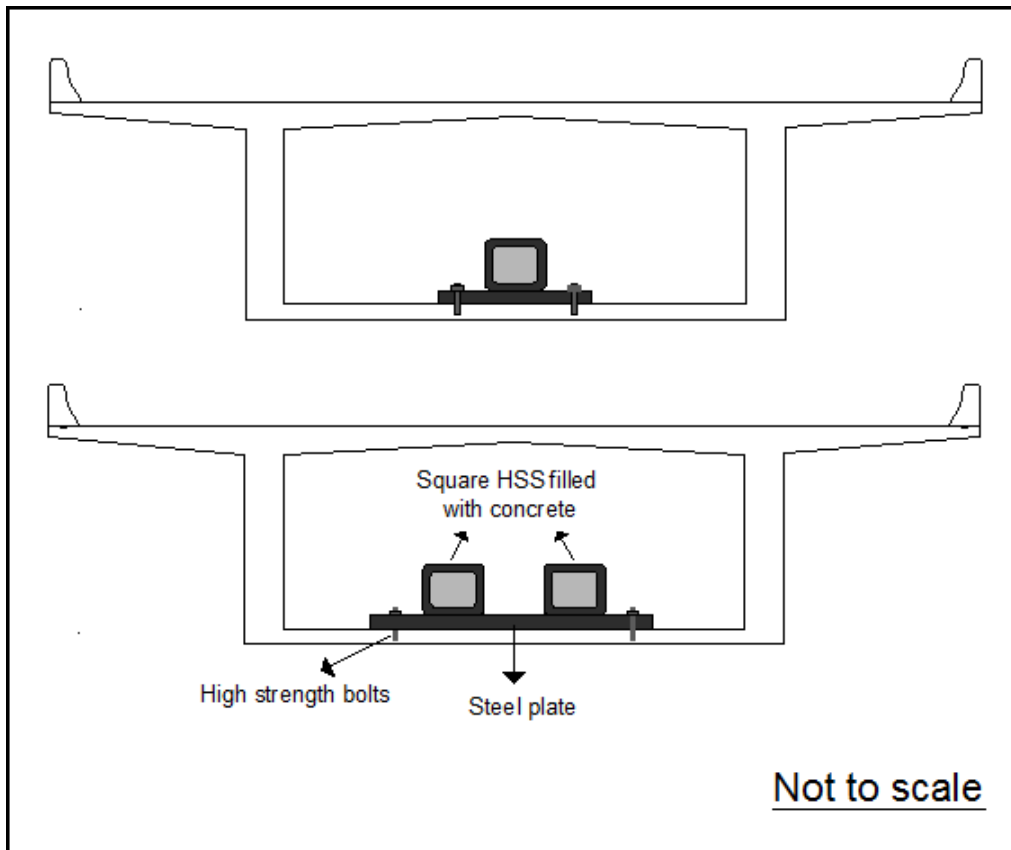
3 Cross-section view of the proposed retrofitting measure for shear keys.
